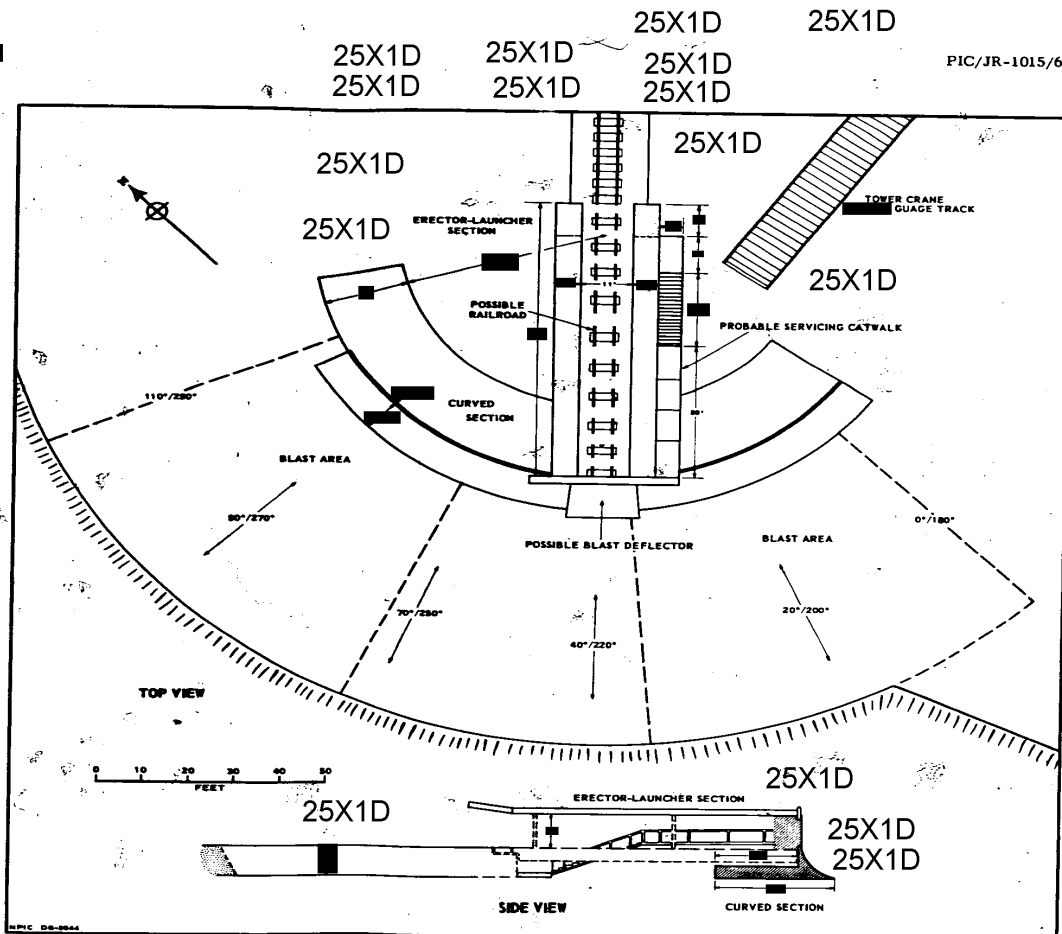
TWO VIEWS OF THE RAIL-SERVED LAUNCH STRUCTURE AT LAUNCH SITE 1D.
